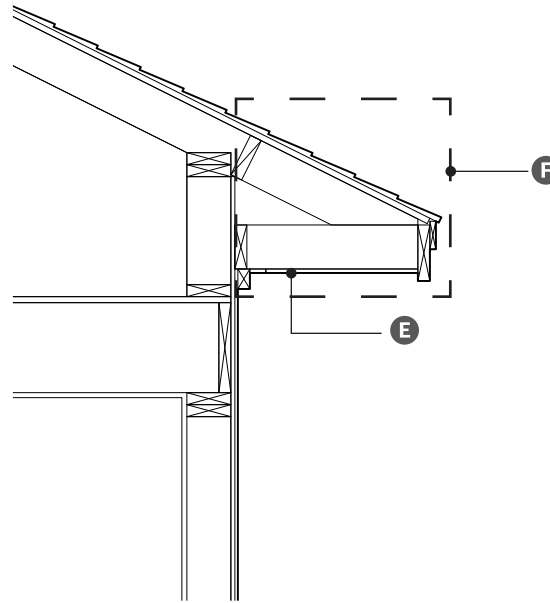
E Section detail of Highest Top Plate for pitched roof.
